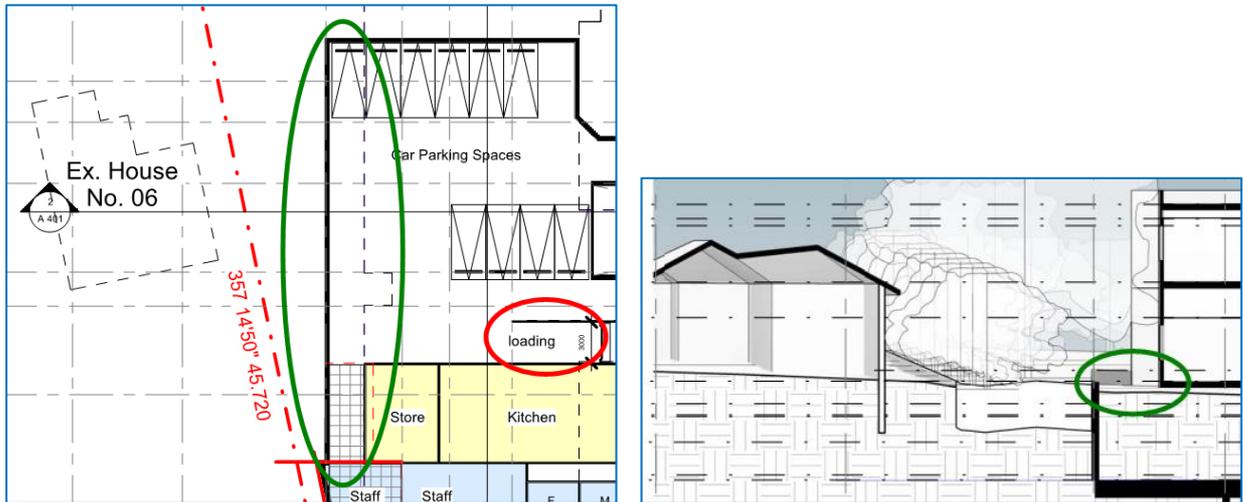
Plan (left panel) and section (right panel) drawings showing the loading dock (red) and the opening to the west (green).
